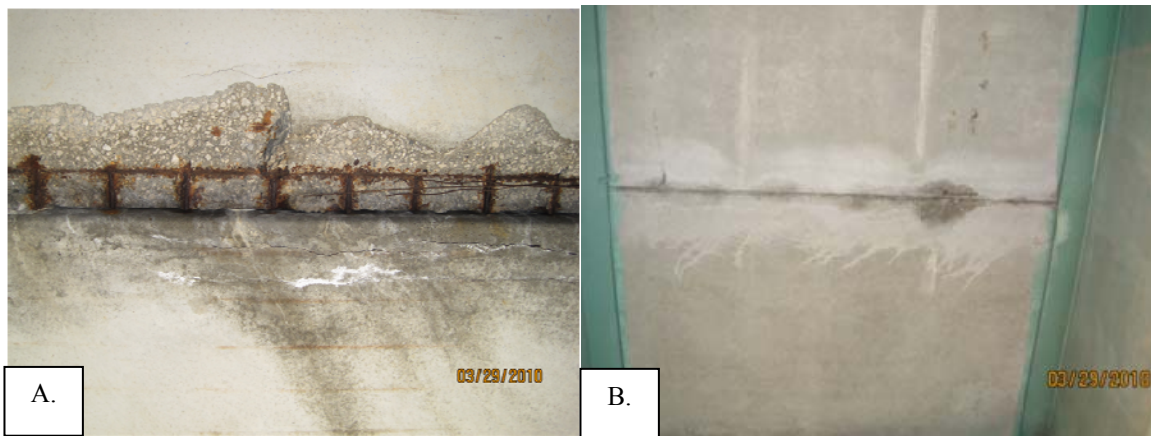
Images of Bridge Deterioration from St. Louis Bridge Investigations (A. Worst case spalling found in Bridge A4067, B. Panel joint experiencing waterstaining and efflorescence in Bridge A4705)
